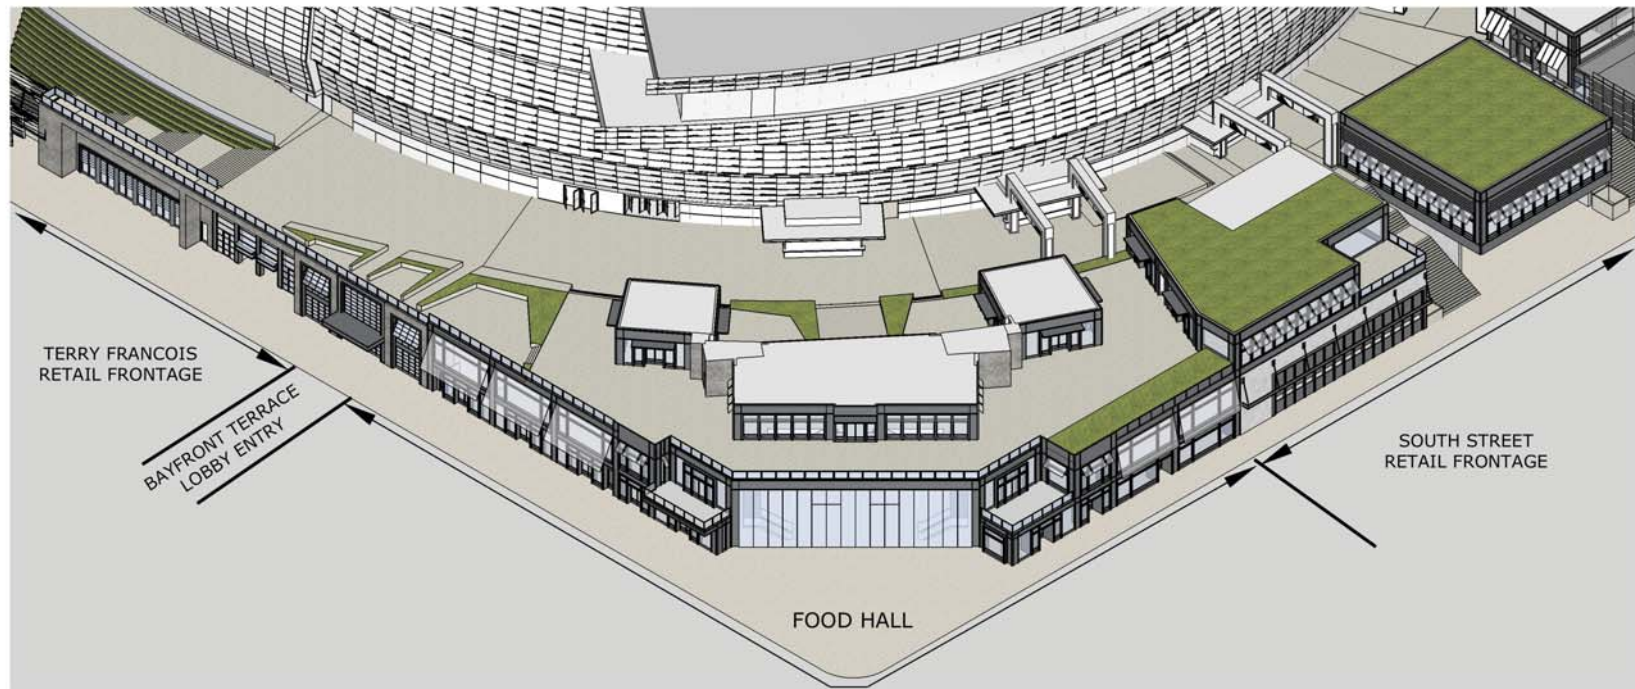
| ISOMETRIC OVERVIEW OF NORTHEAST RETAIL
